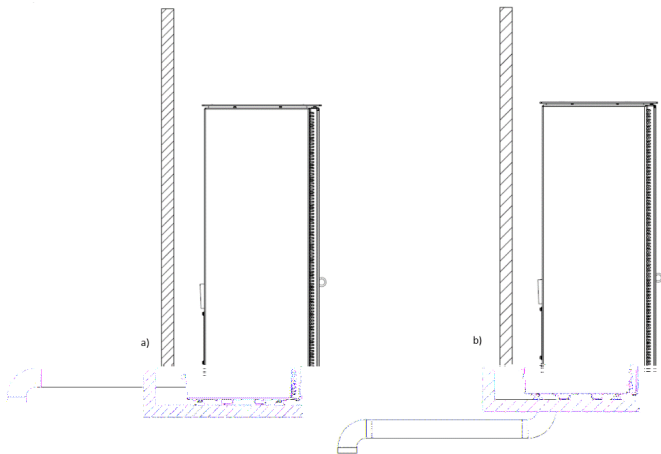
Combustion air intake ducting: a) Rear air intake port; b) Bottom air intake port
